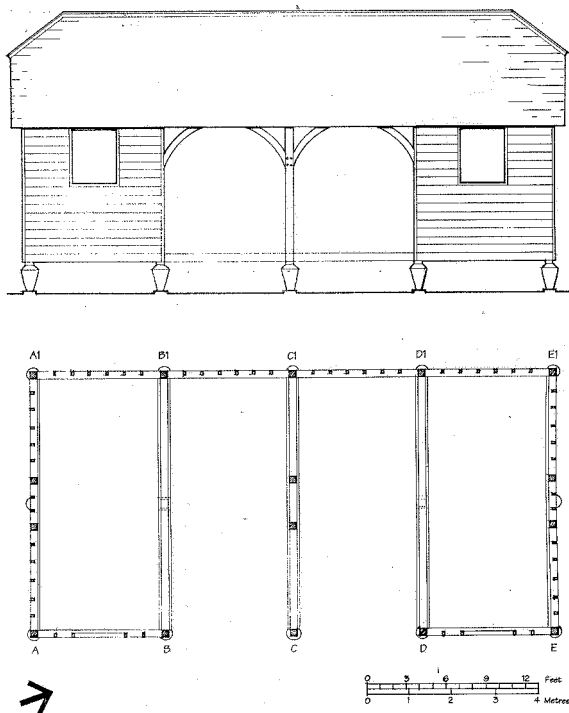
Plan and Eastern Elevation. The two central bays were apparently always open on the Eastern side, with no sill beams.
